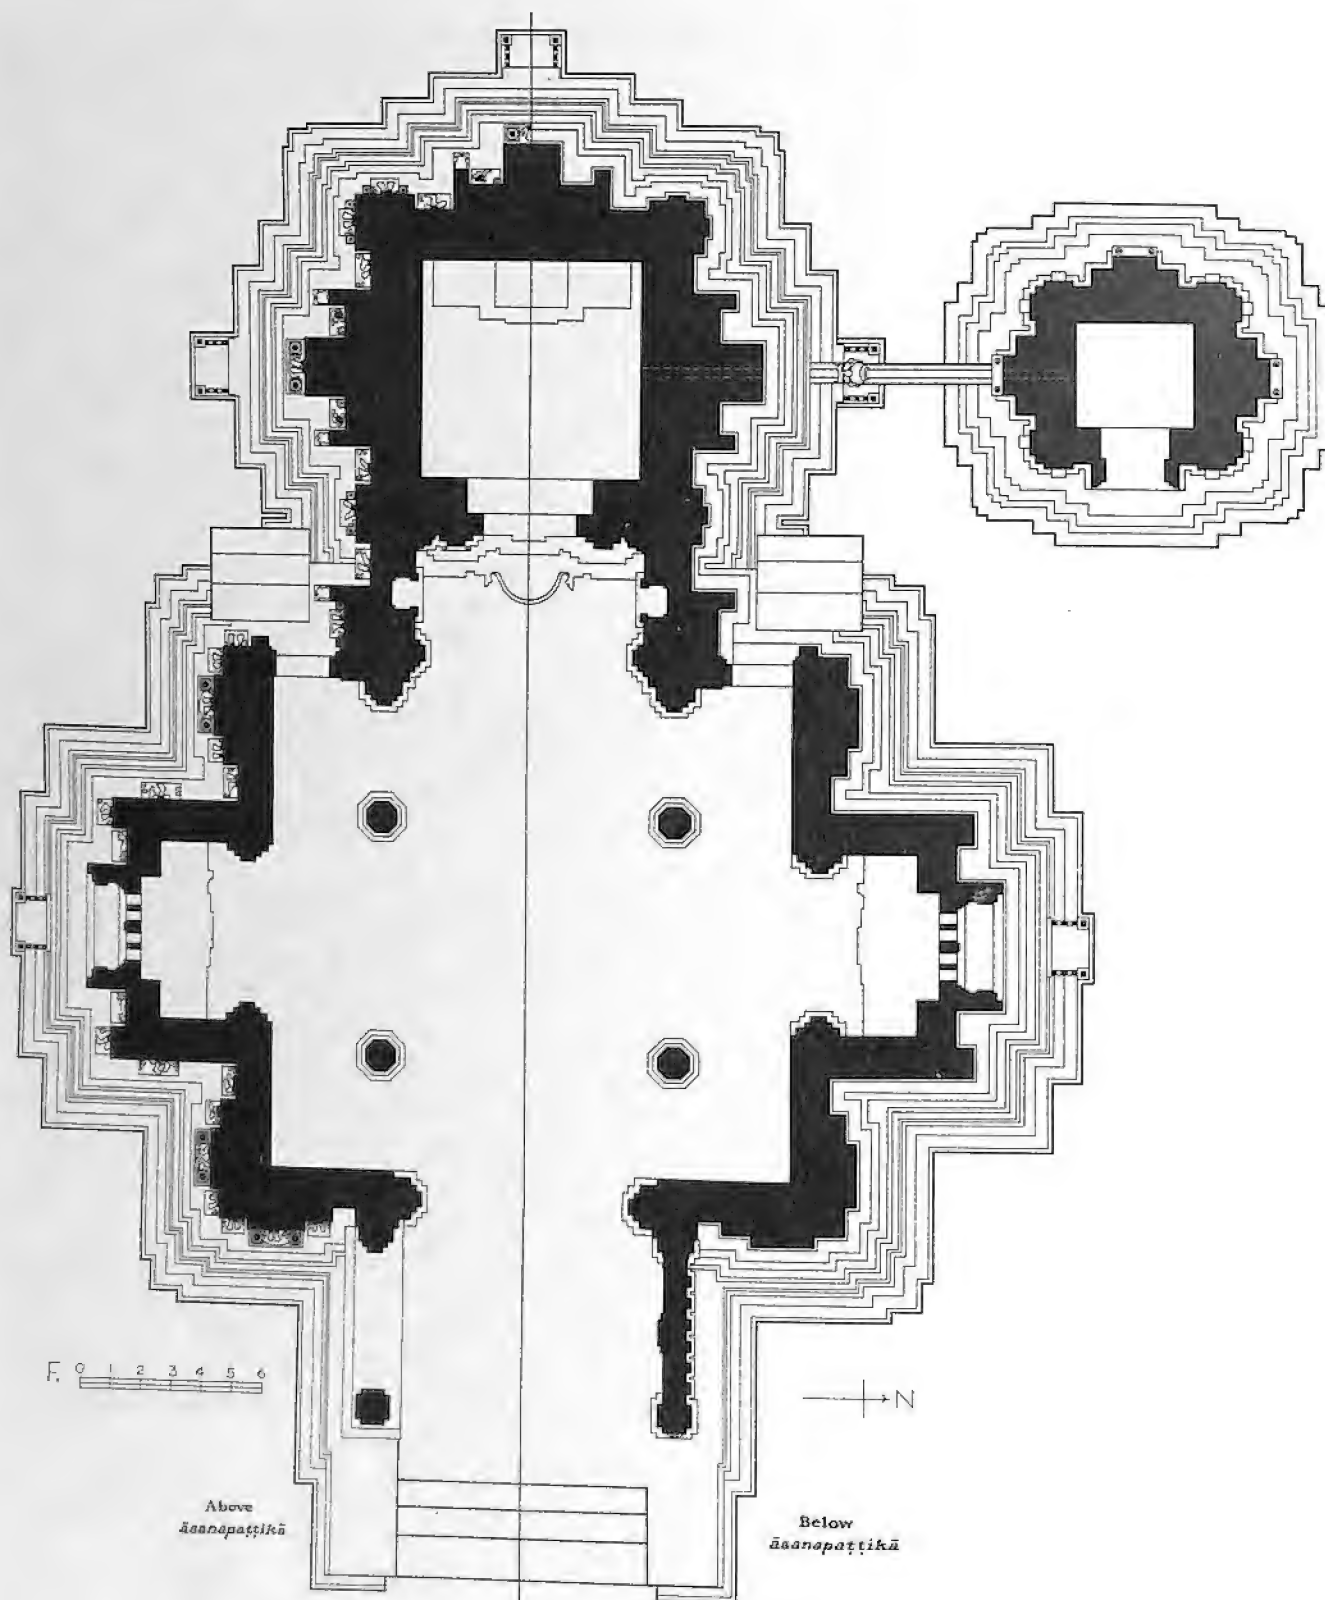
Jagat. Ambikā temple and snāpana-gṛha, plan.
